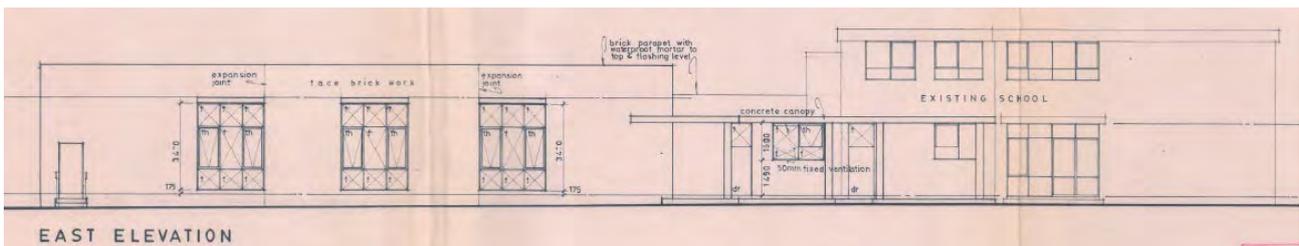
Drawing related to building permit 7845. Proposed east elevation (Nicholas Katris & Assoc. June 1979) (Source: Council Building File)
